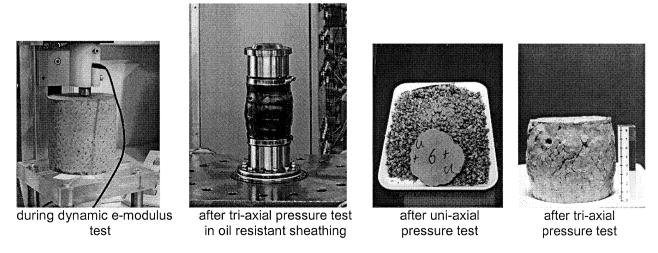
CONSTORIT® specimen before and after different kinds of tests
